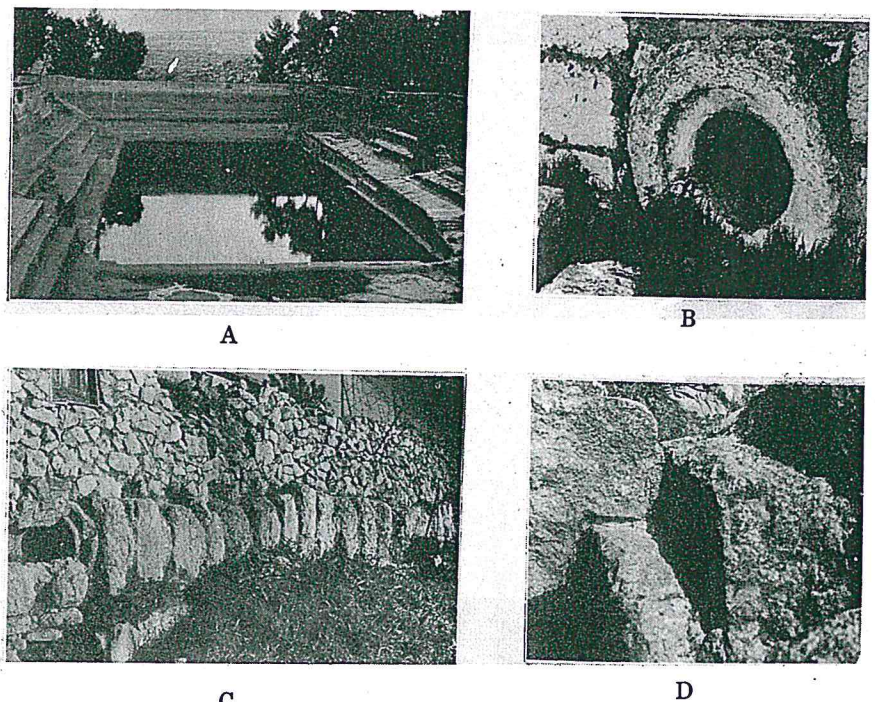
The ancient water conduit system of Jerusalem. A. King Solomon's Reservoir; B. The pressure conduit of stone; C. & D. Details of the pipe and the joint.
